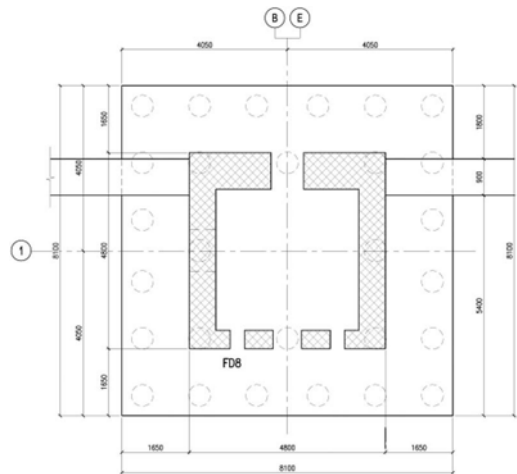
Typical deep foundation of the RC towers supporting the roof of the pavilion.
